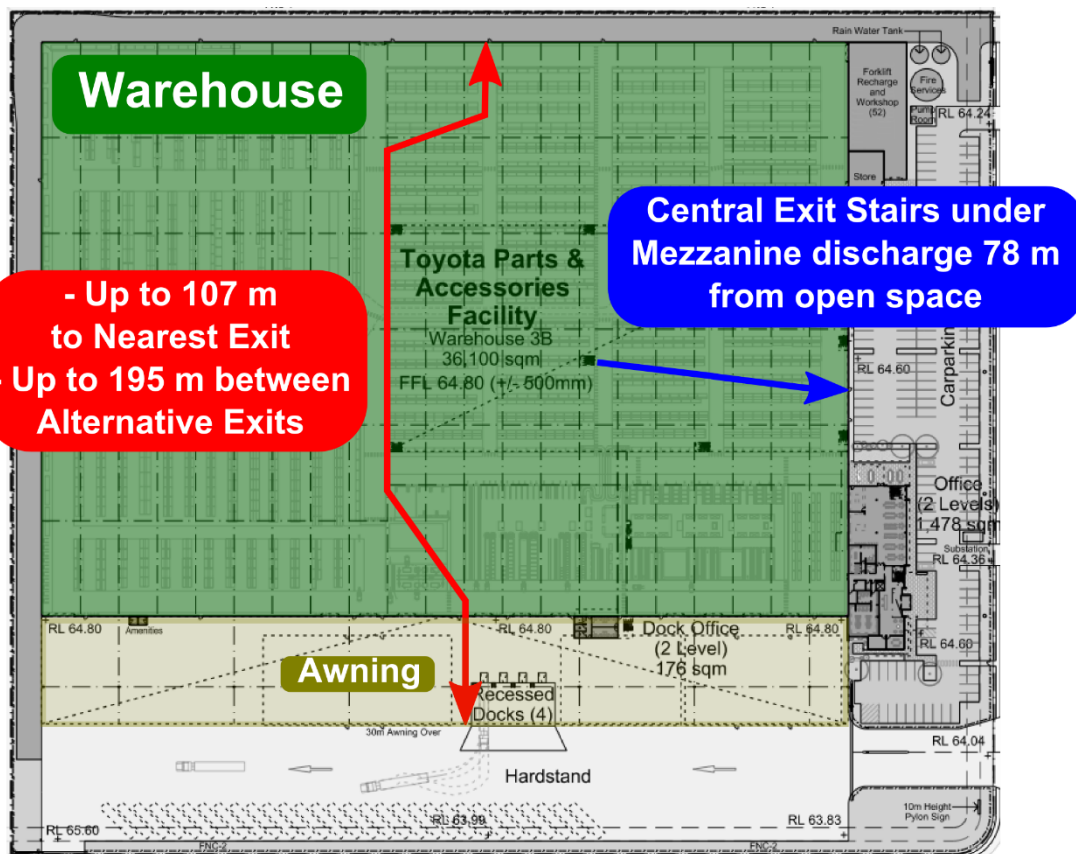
DtS non-compliant travel distances to nearest exits and between alternative exits on the ground floor of the warehouse
